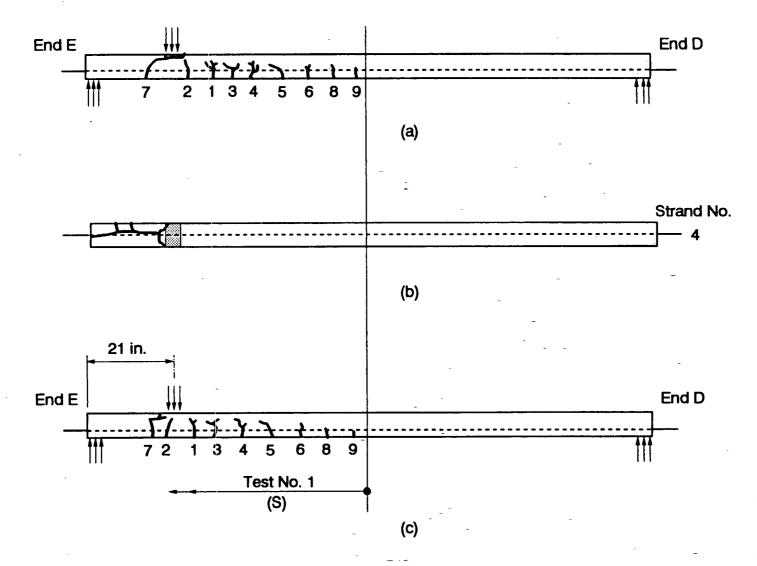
Crack pattern for D-type Specimen No. 17-6.0DC-12:
